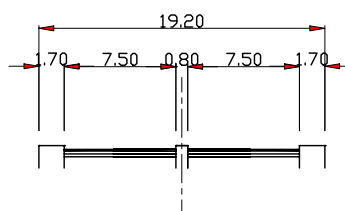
Typical Cross Section on Av. Pedro Cabral
